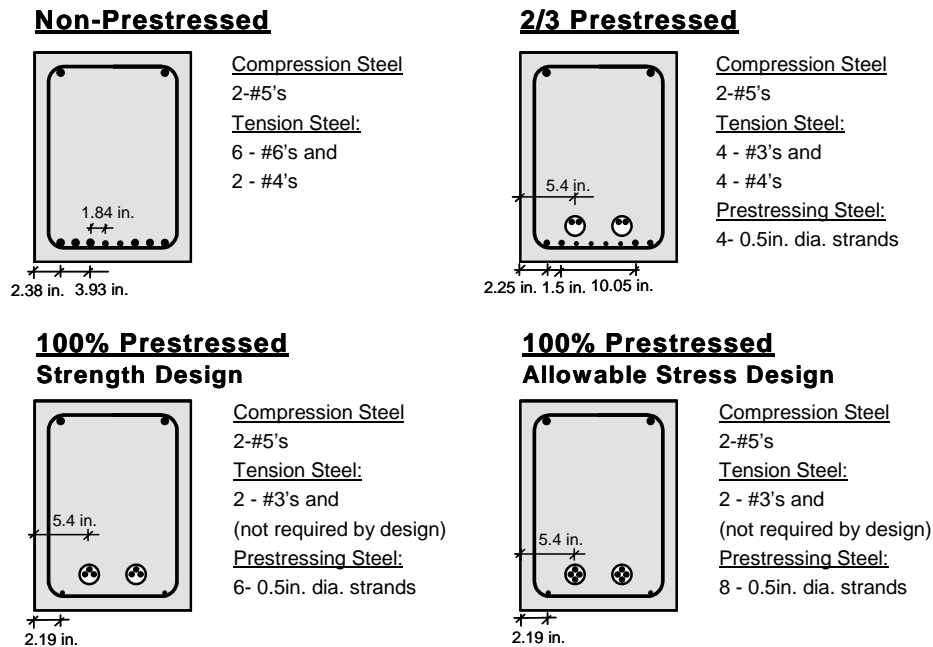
Section Reinforcement Details<sup>2</sup>
